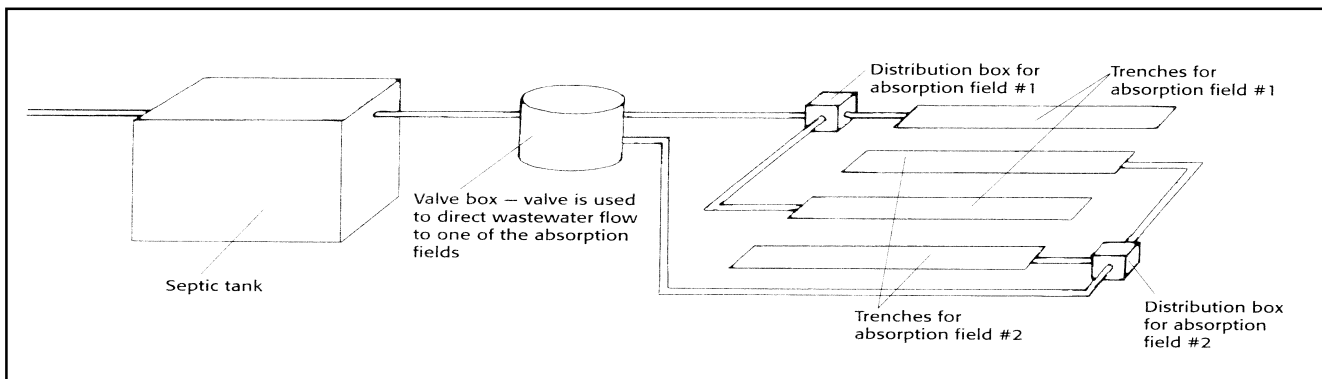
A septic system with alternating trenches offers another way to disperse wastewater over a drainfield.
